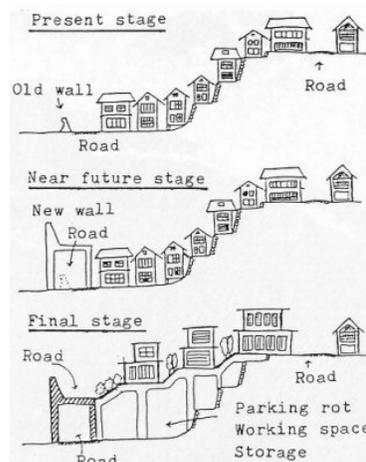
Sketch of village improvement plan of fishing villages along the Sanriku Coast, Japan. Tsunami protection relies much on sea wall (Fukuchi and Mitsuhashi, 1983).
